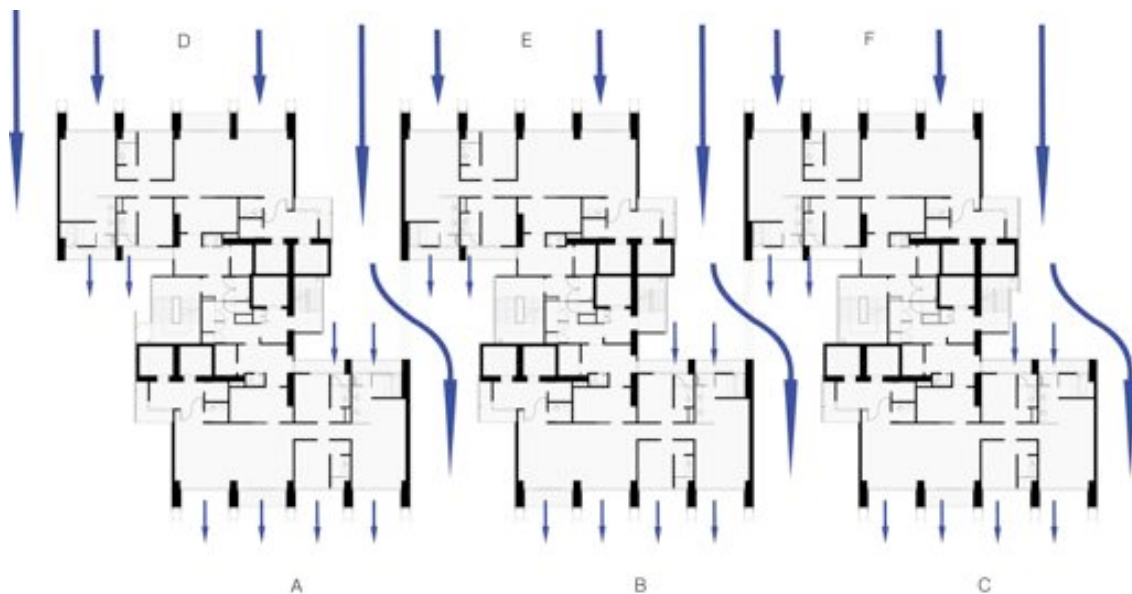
29th Floor Plan the MET with Wind Circulation; © Ferdinand Oswald, WOHA (8)
